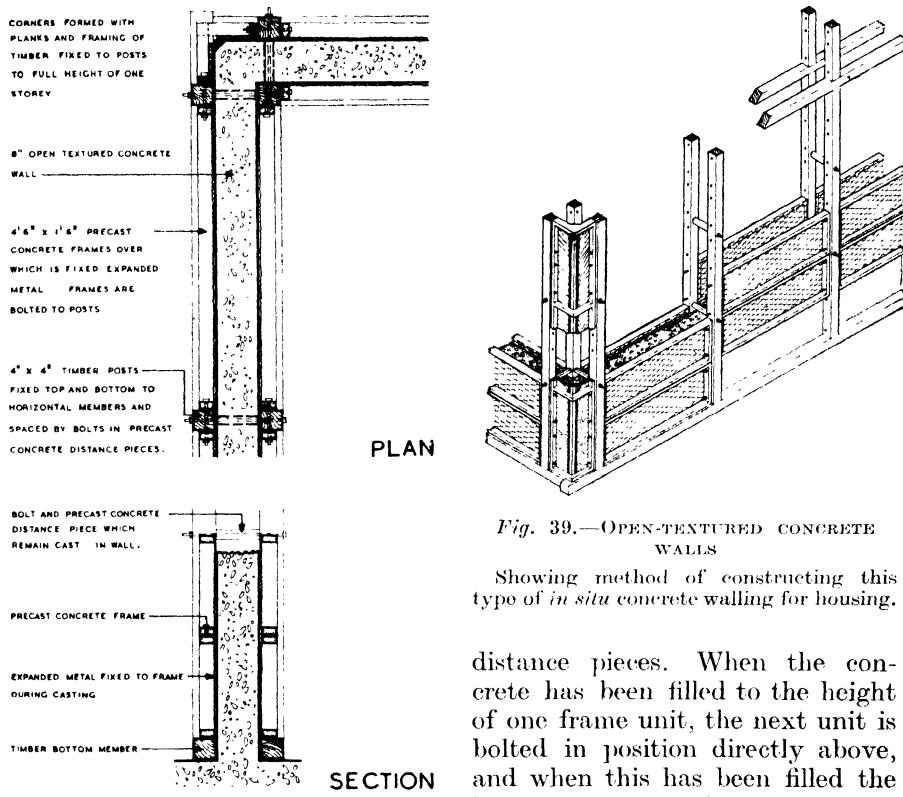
OPEN-TEXTURED CONCRETE WALLS
